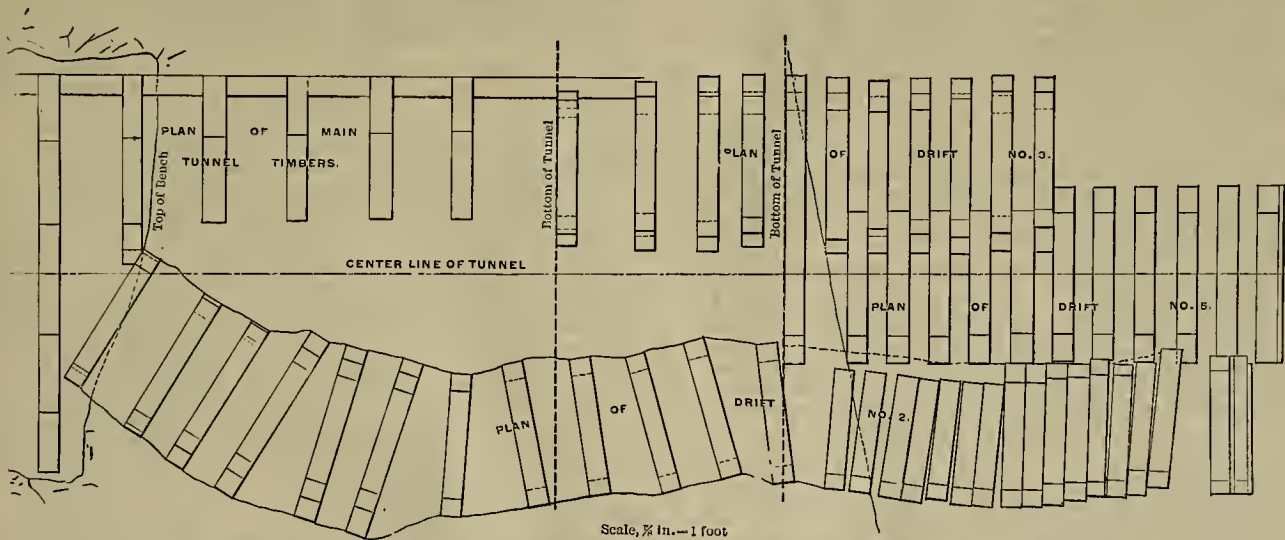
PLAN OF FIG. 3, SHOWING DRIFTS AND TIMBERING IN BAD GROUND.
